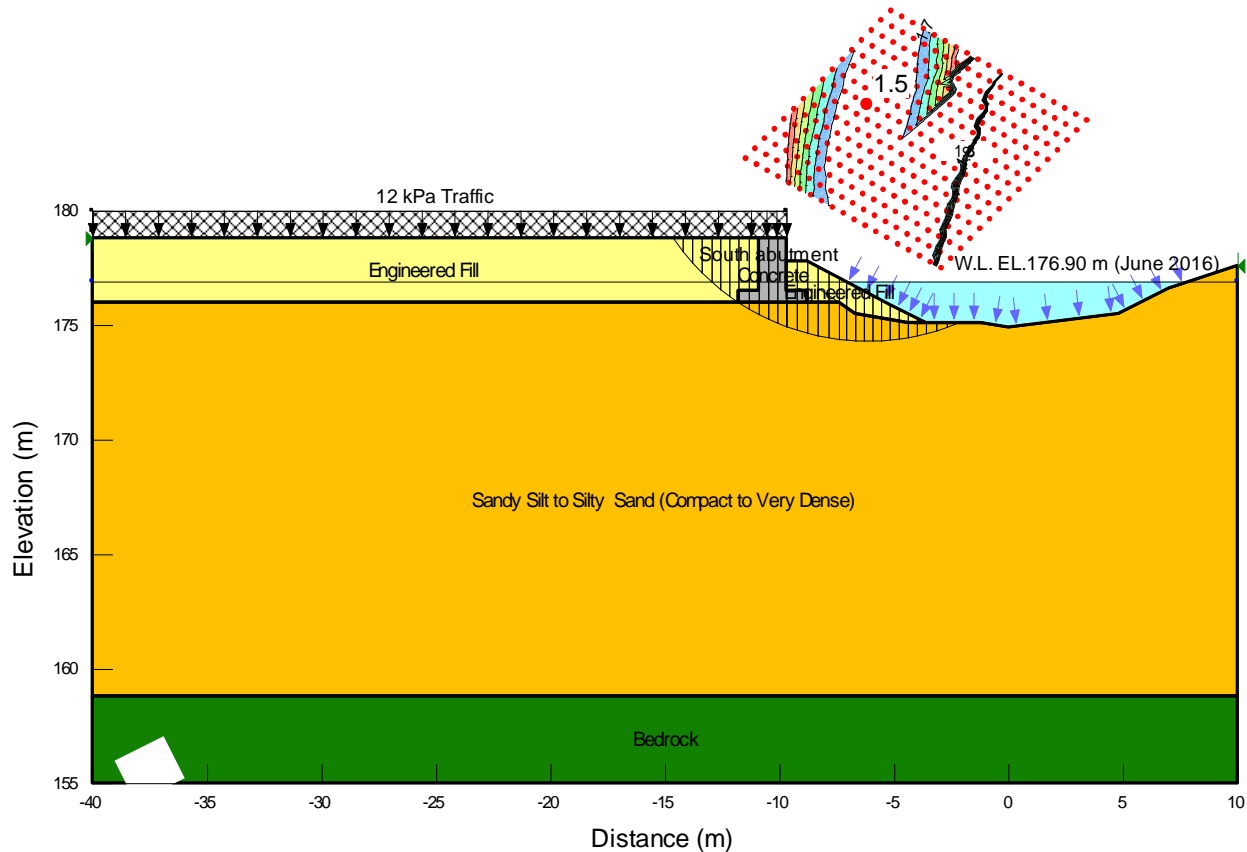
Proposed Permanent Bridge South Abutment - Drained Seismic Condition
